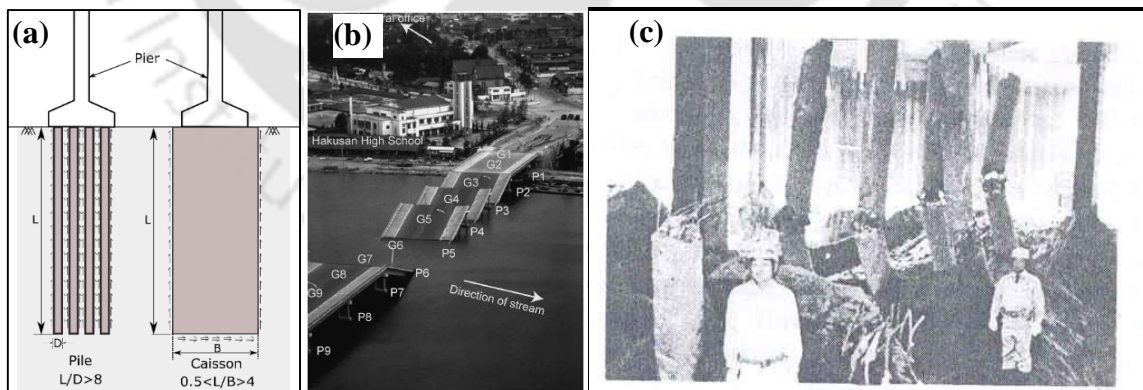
(a) Crude slenderness ratio based classification of flexible pile and rigid caisson foundations (modified after Gerolymos and Gazetas 2006) (b) Collapsed Showa Bridge in Japan during 1964 Niigata earthquake (after Yoshida et al. 2007) (c) Pile failure observed during the excavation of NHK building after 1964 Niigata earthquake in Japan (after Kawamura et al. 1985)
